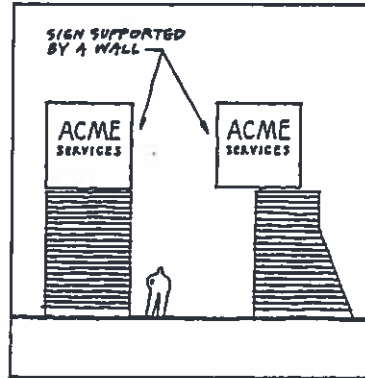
C SOME EXAMPLES OF HIGHER GROUND SIGNS ON WALLS
